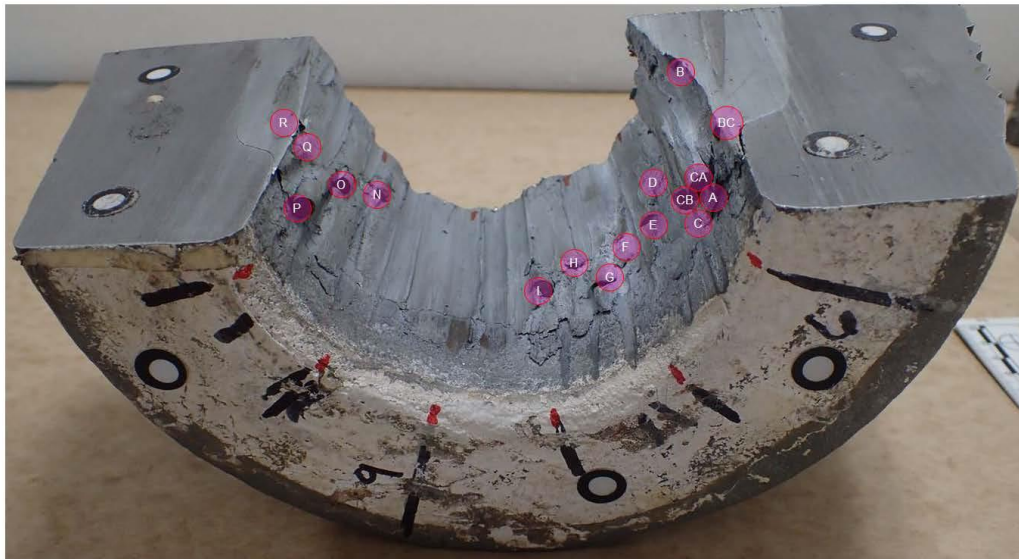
Wire map of the socket base side of slice 9g. Pink wire labels are wires that fractured within the socket.
